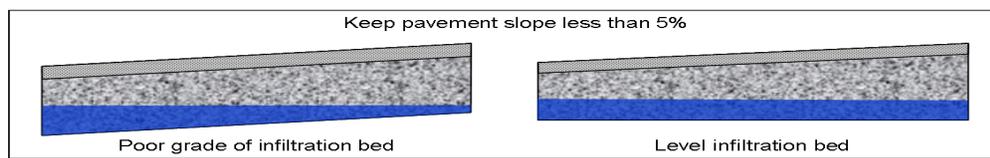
Level infiltration beds and limited pavement slope maximizes stormwater treatment and storage.
